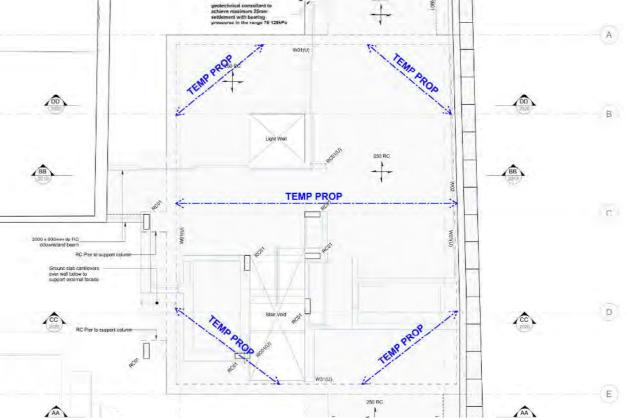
Plan at Ground floor indicating possible flying shores at close centres to restrain surrounding earth until slab is poured
